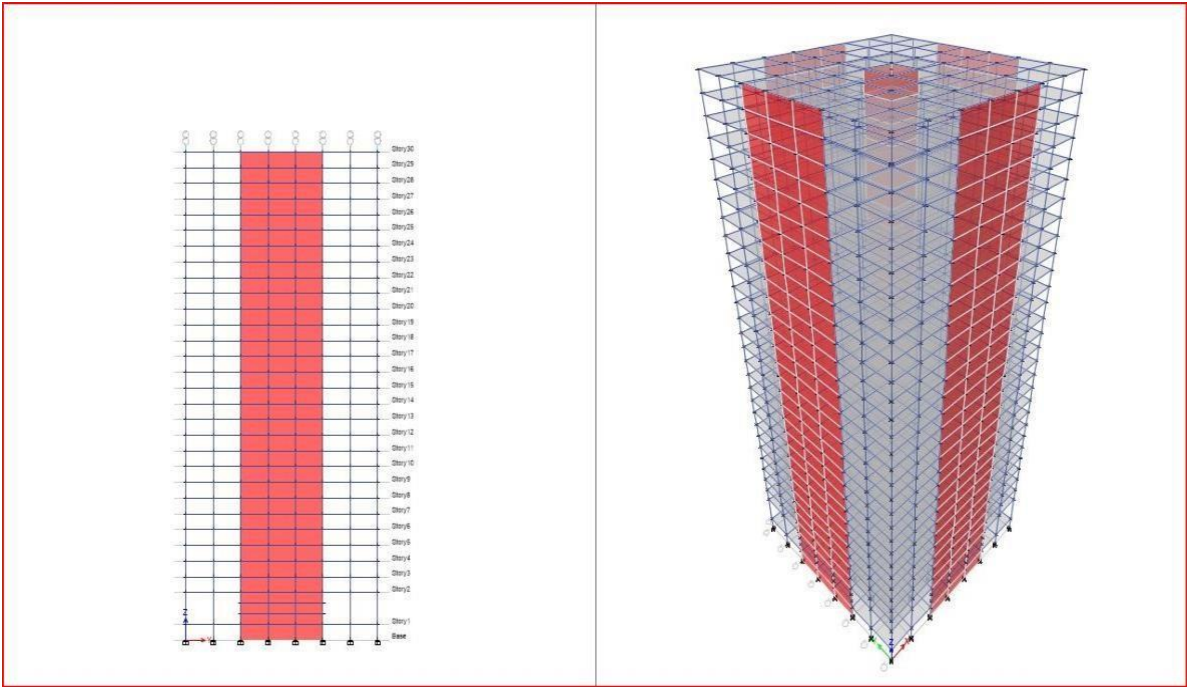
Elevation and 3-D view of Soft Story model with horizontal stiffeners at the bottom G+30
